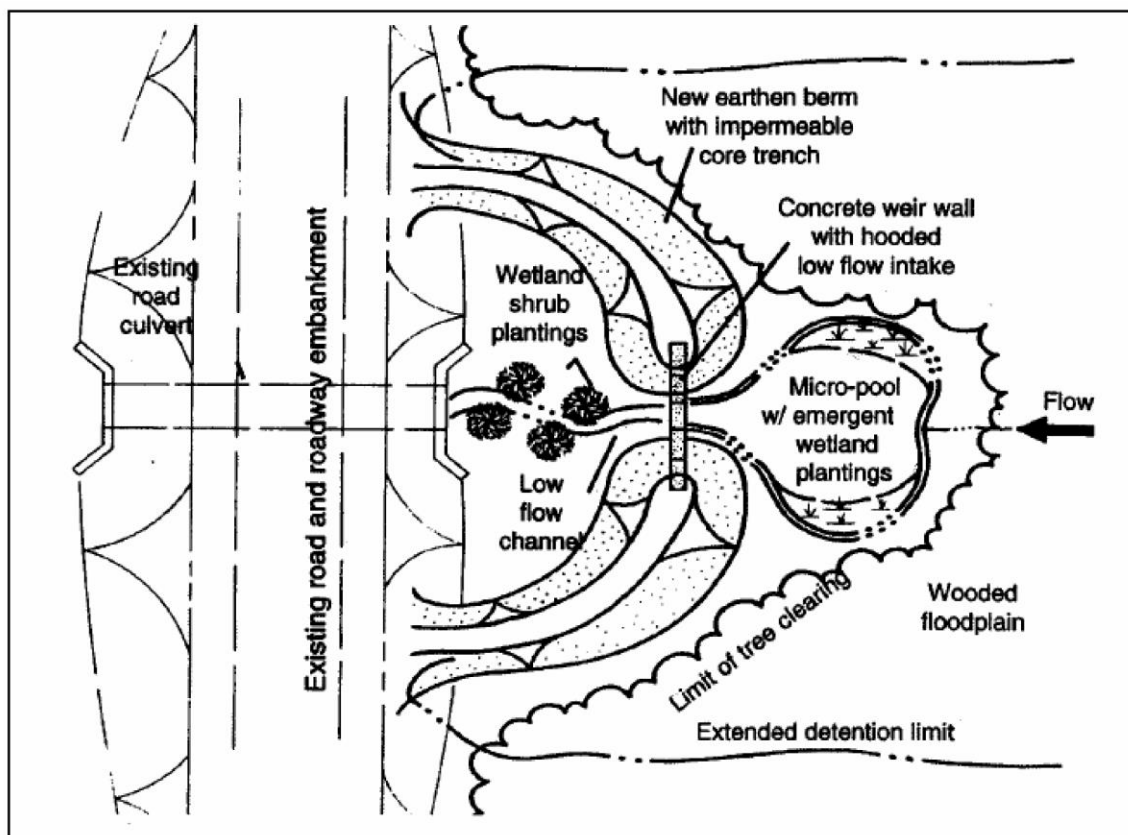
Culvert Retrofit (Source: Schueler et al. 2000)
